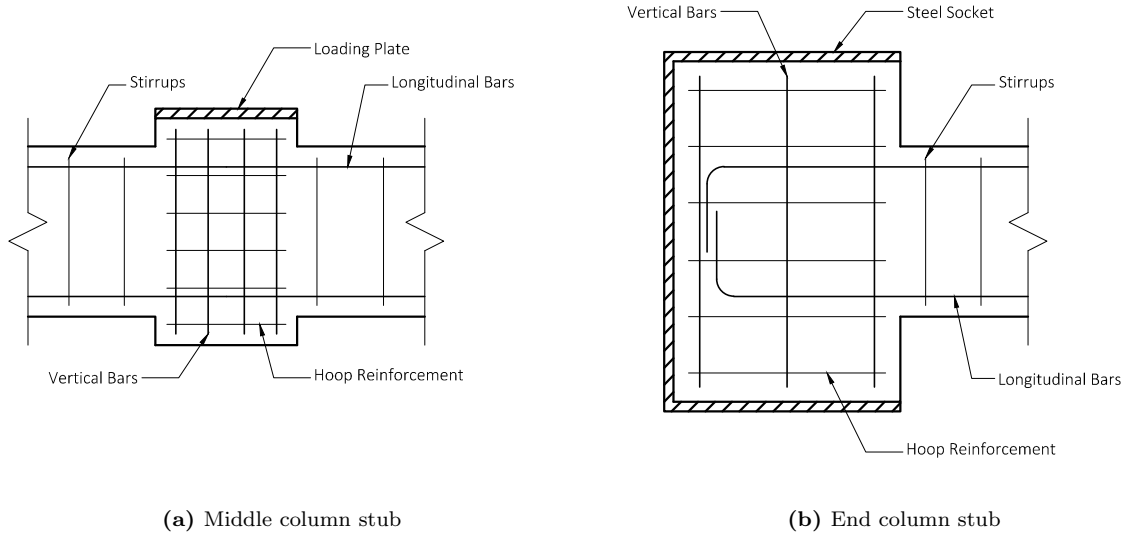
Reinforcement layout in the column stubs, adapted from Su (2009).
